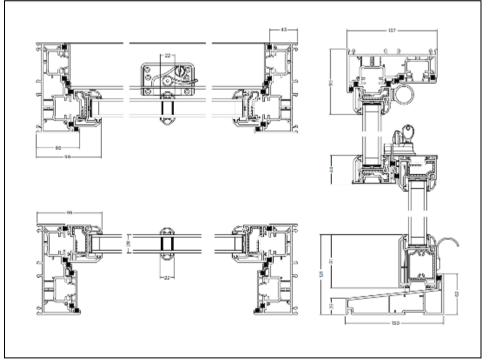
New uPVC sash window details, showing the profile sections and narrow glazing bar
